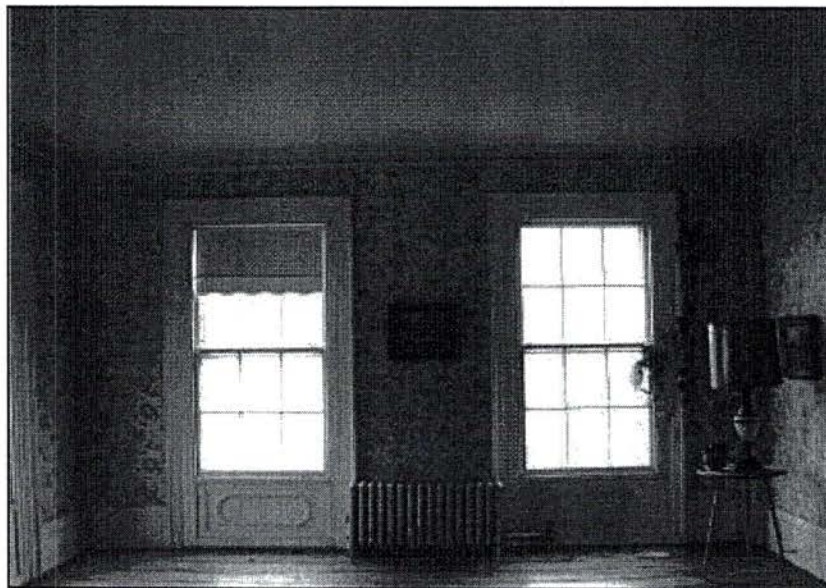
View looking east in Room 100 showing the decorative skirts under the windows.
